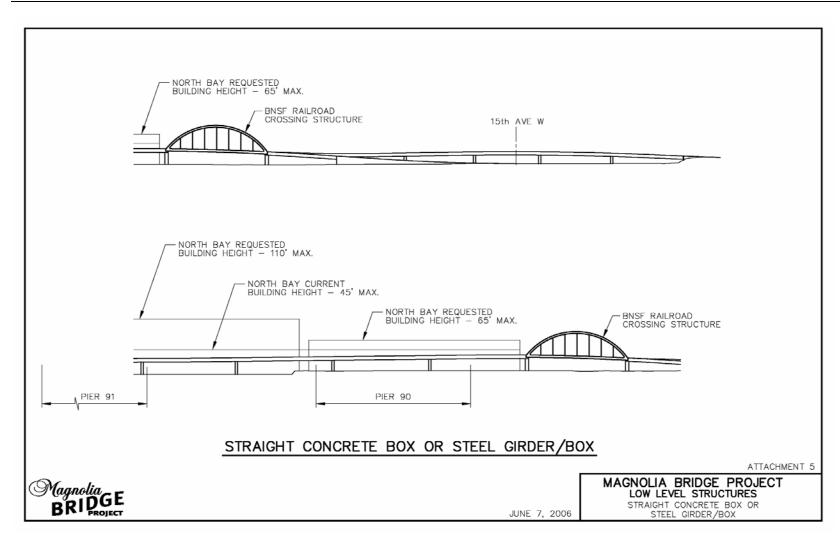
Low Level Structures Straight Concrete Box or Steel Girder/Box
